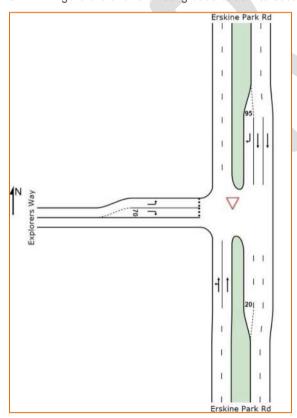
Existing Intersection Layouts assumed in the SIDRA models
